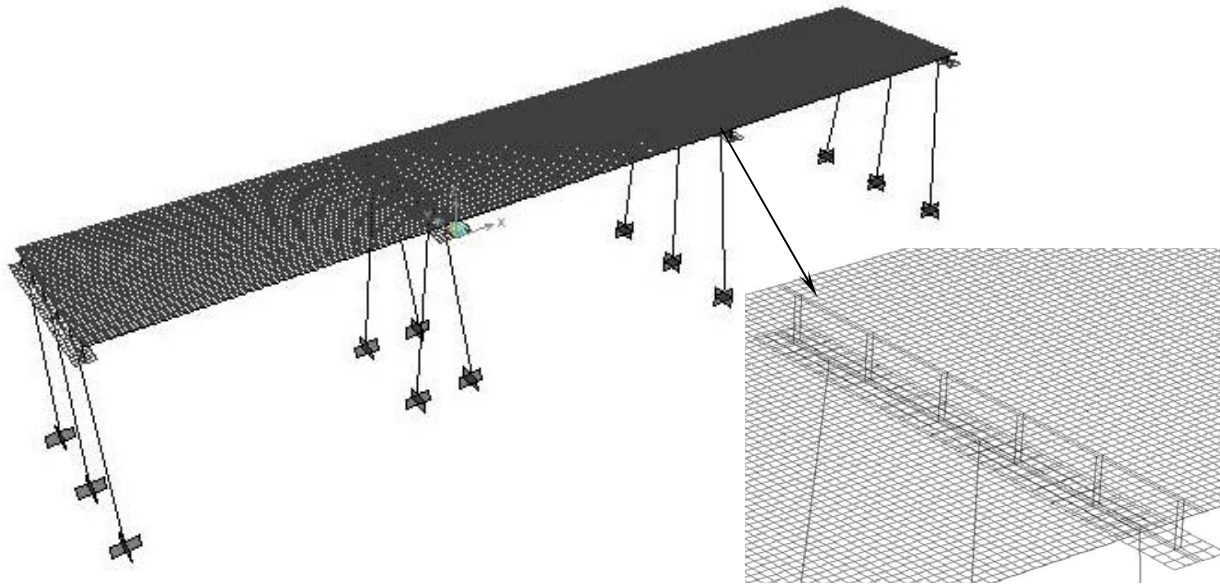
Typical finite element model for a 76 ft span non-skew bridge.
